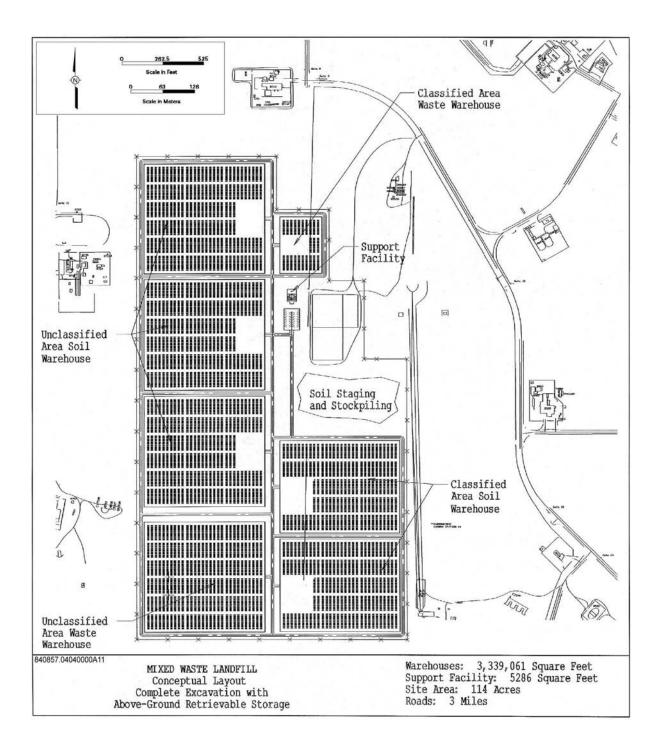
Proposed Aboveground Retrievable Storage Facility for Complete Excavation (MWL Alternative V.a)
